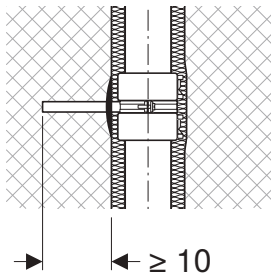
Anchor point in insulated straight ceiling feed-throughs embedded in concrete
